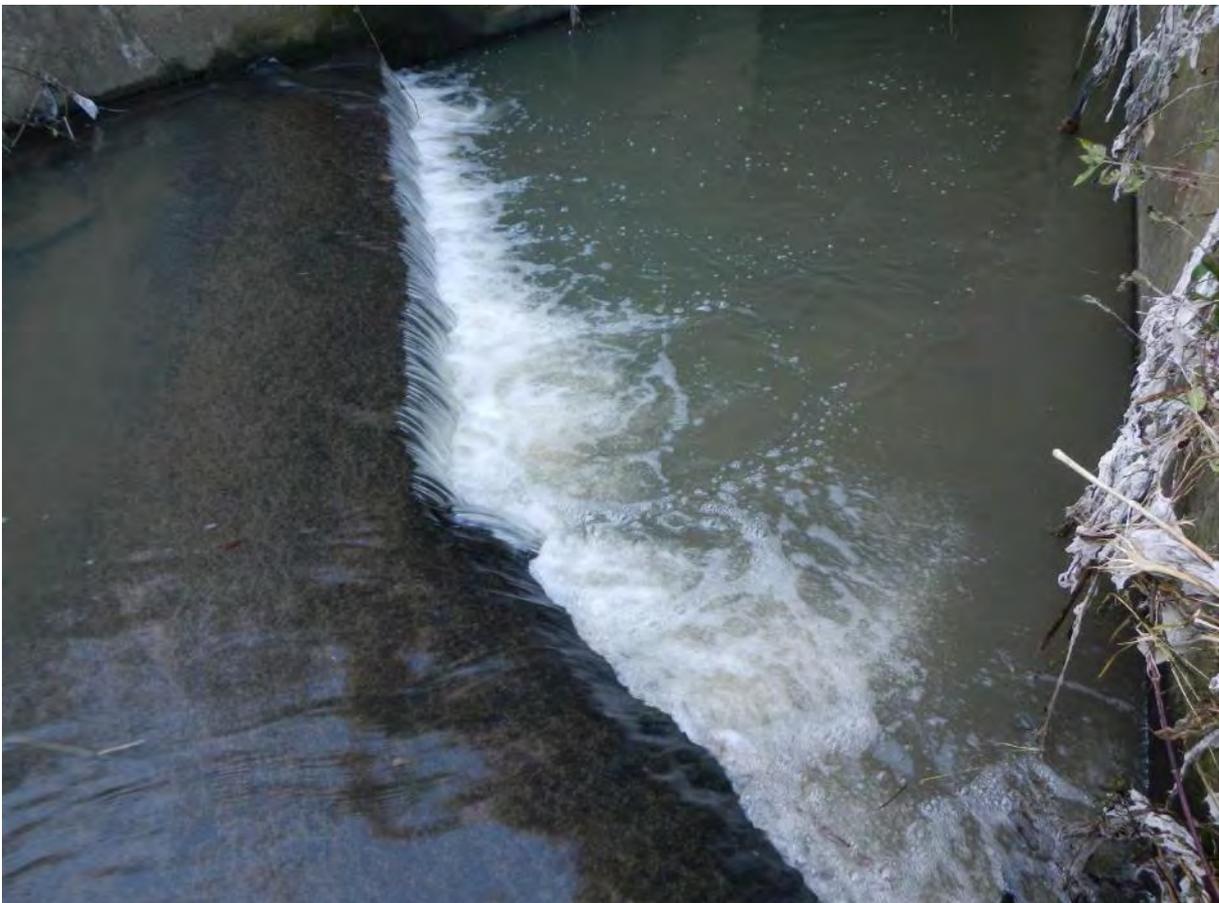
Concrete step/weir and shallow water create a small obstacle to fish passage.
